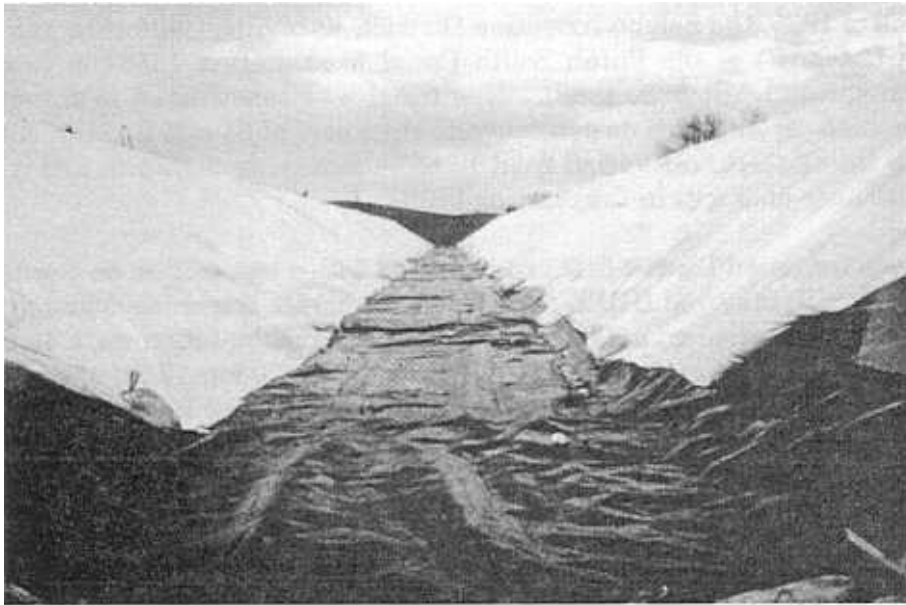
View of fabric form concrete protective revetment material on side slopes prior to injection of concrete grout.
